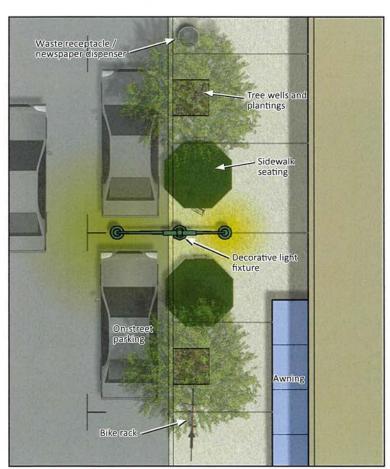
B: Illustrative pedestrian zone treatment - plan view (typical condition, guideline only)
